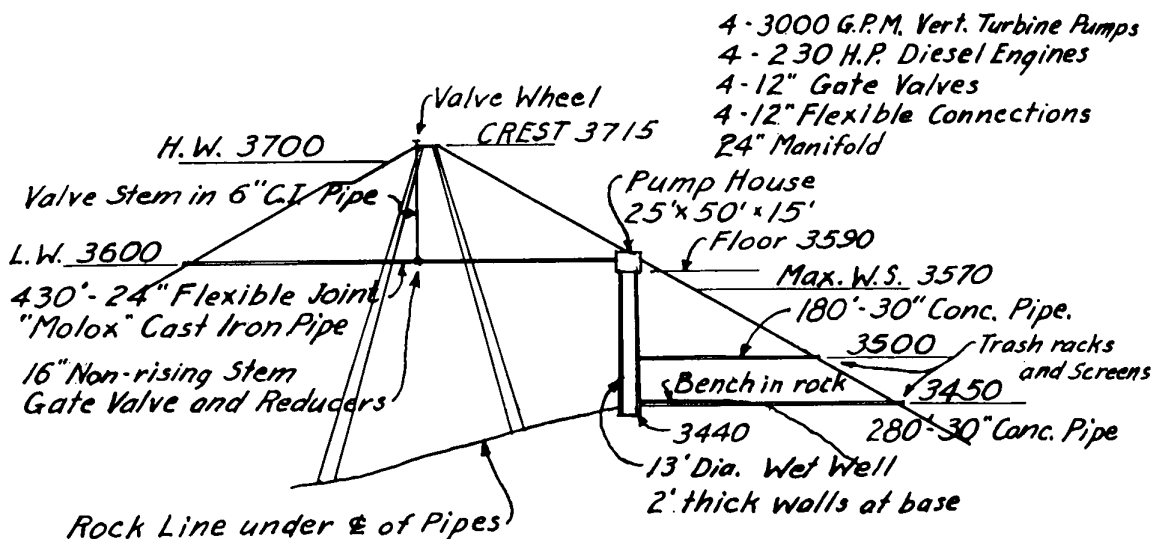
SECTION ALONG CENTER LINE OF PROPOSED PUMPING FACILITIES
